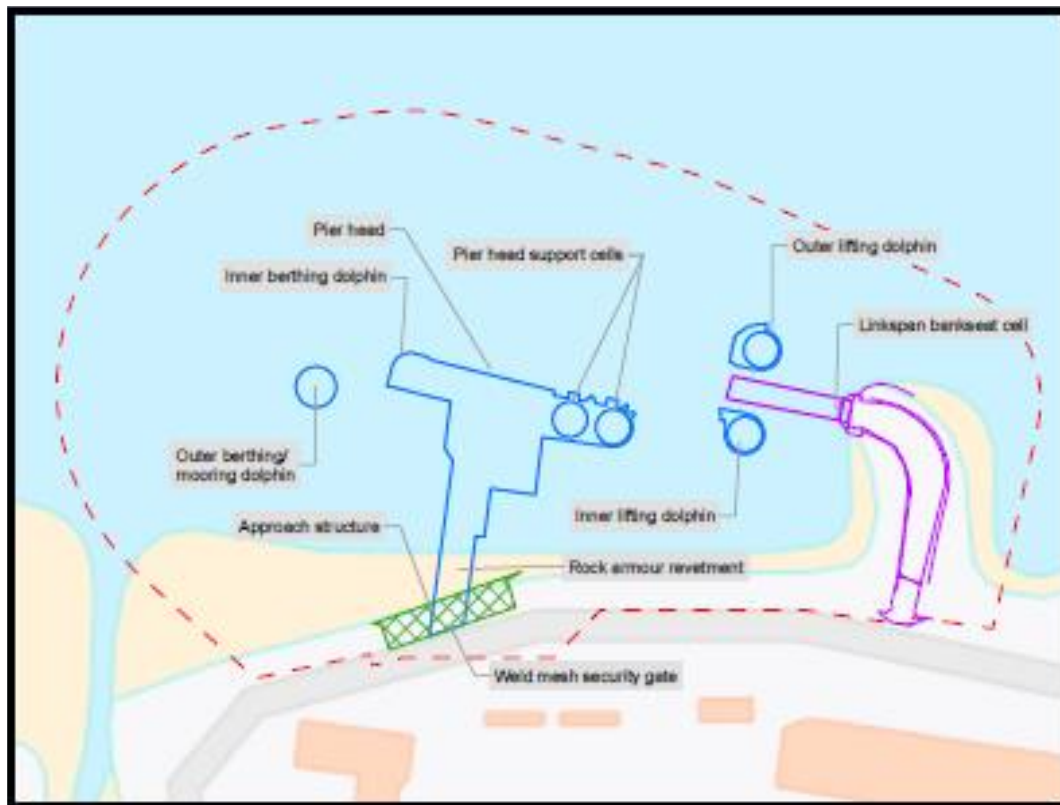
The structures to be removed are shown in blue and the area of construction of the rock armour revetment is shown in green. The linkspan bankseat shown in purple will be retained.
